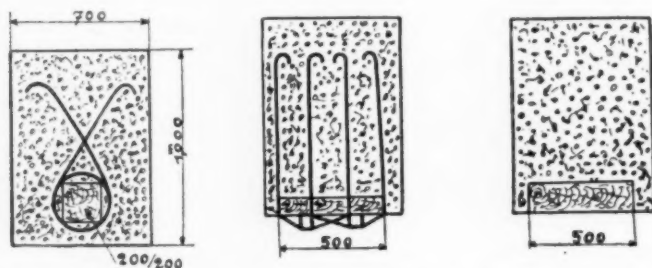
DISTRIBUTION OF WOOD REINFORCING ELEMENTS IN CONCRETE BEAMS RECOMMENDED BY AN AUSTRIAN COMMISSION
